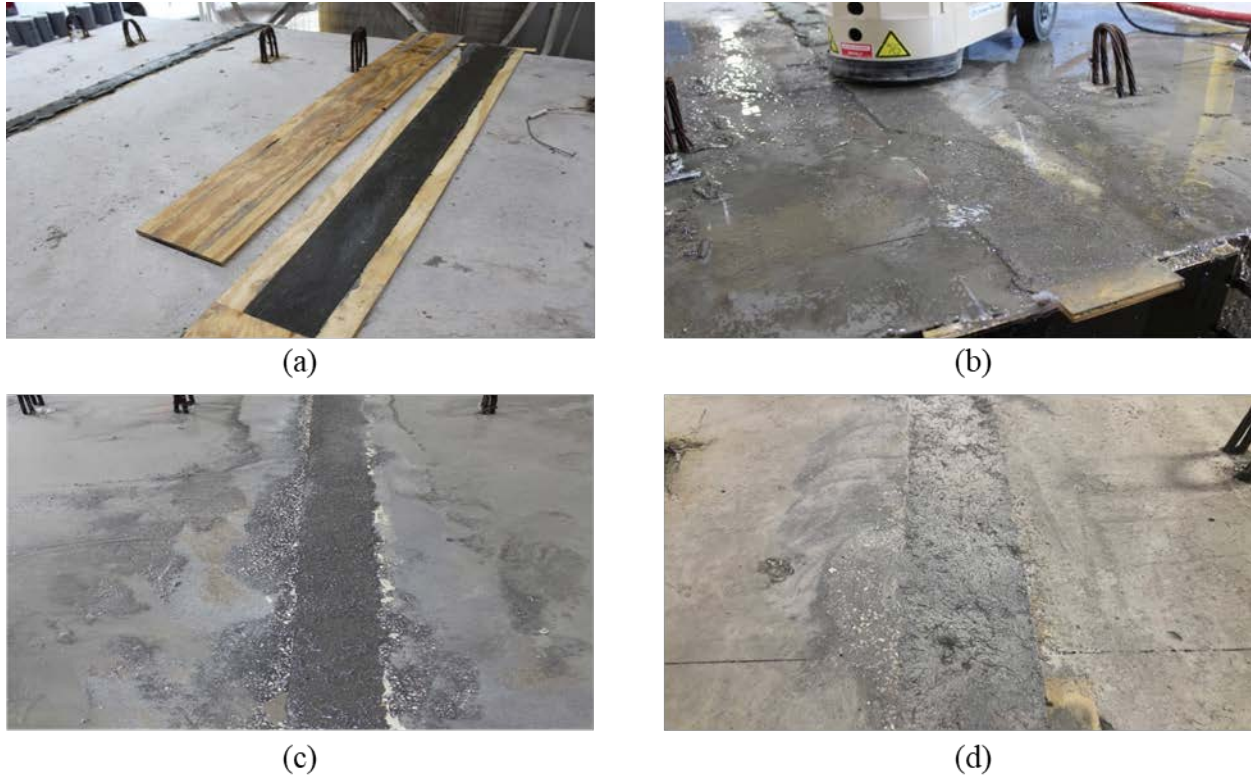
UHPC joint grinding procedure: (a) top formwork removal a day after cast, (b) joint grinding action with electric grinder, (c) joint finish after grinding, and (d) joint surface a day after grinding
